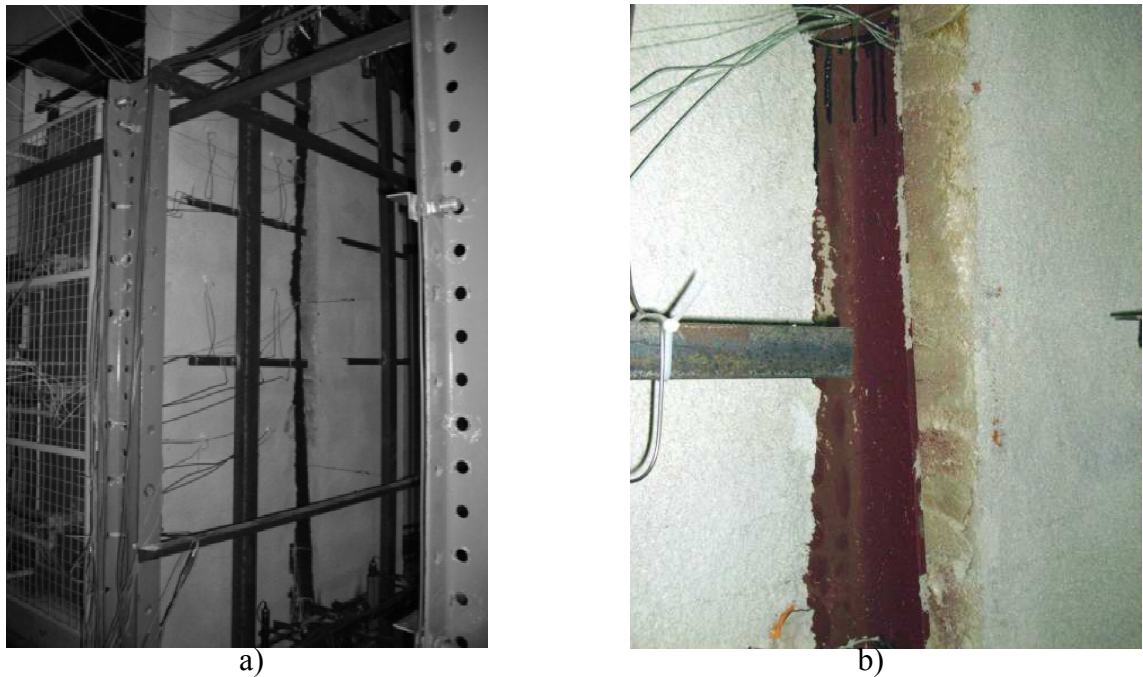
Column E01 during and after test - web parallel to wall – wall thickness 140mm
